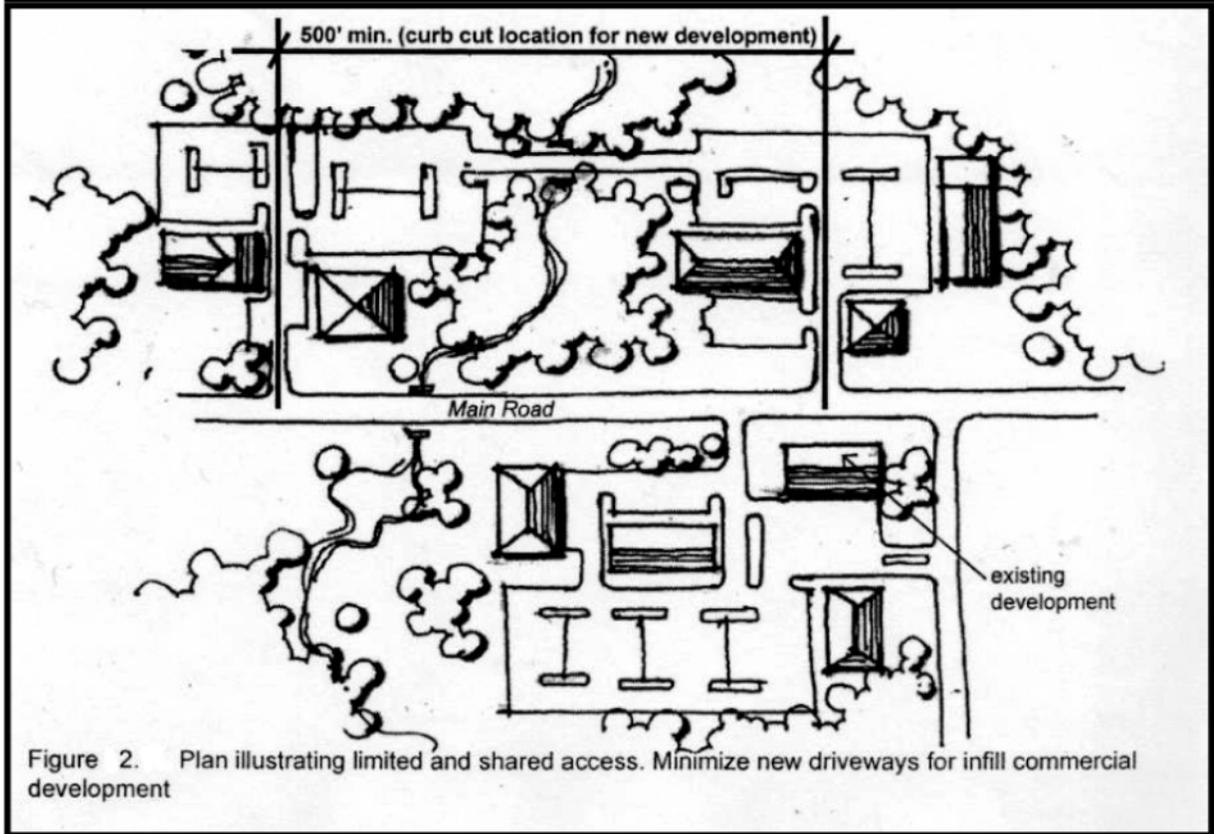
Plan illustrating limited and shared access. Minimize new driveways for infill commercial development
